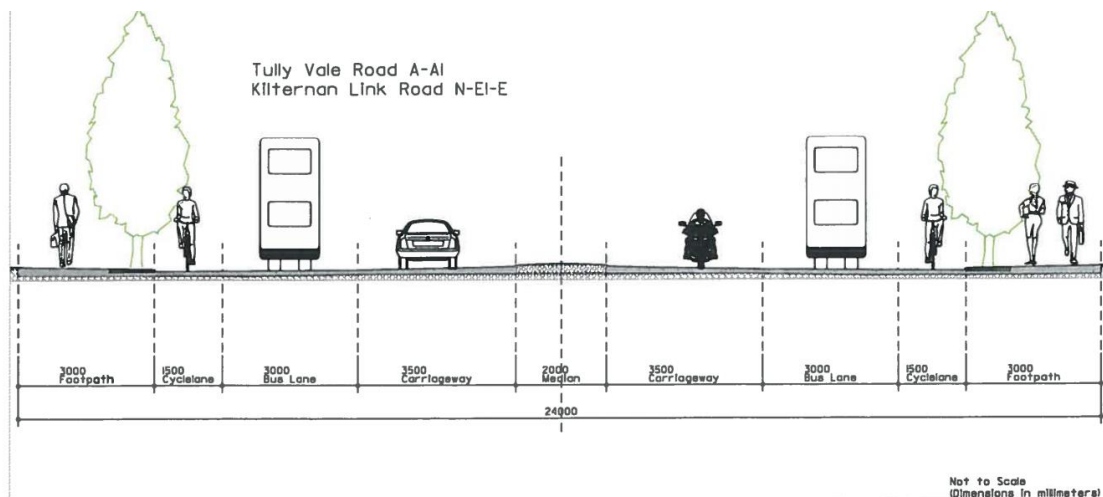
Extract from Cherrywood SDZ showing section of Kilternan Link Road
